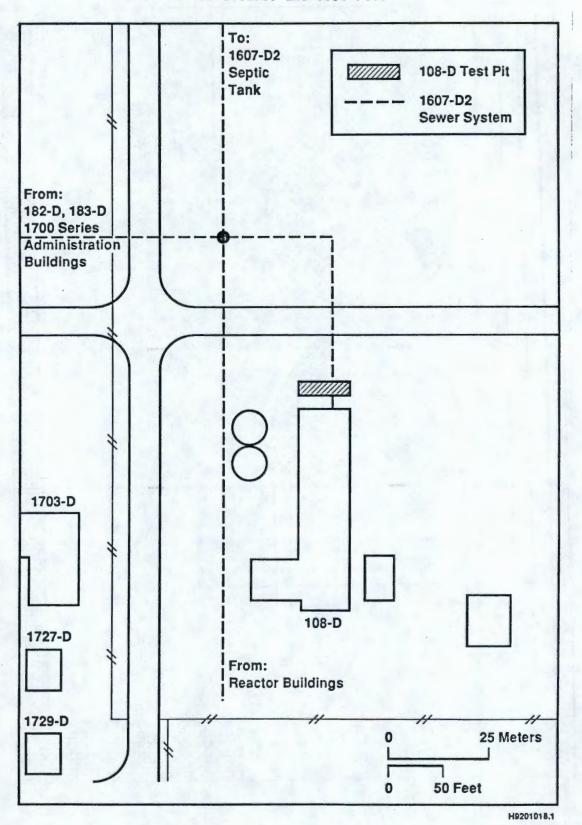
100-D Area 108-D Building, Associated Structures and Test Pit.
